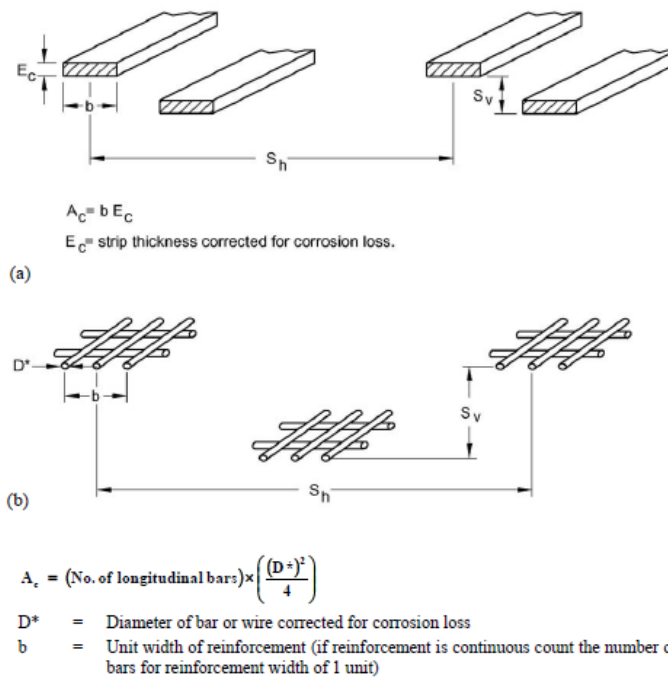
Metal reinforcement parameters (a) Steel strips, and (b) Steel grids (FHWA 2009)
